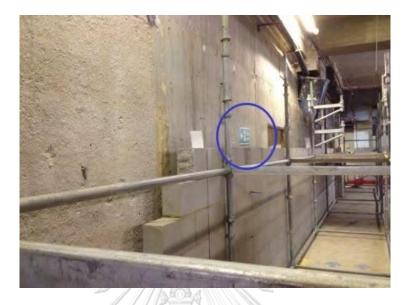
Obscure emergency exit sign on the construction site Source: (Galea et al., 2019)
